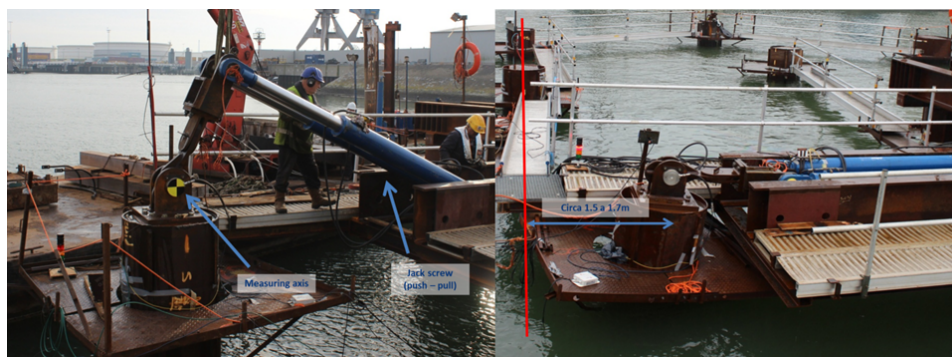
Rearranging the loading set-up between static push and pull tests. [18]
